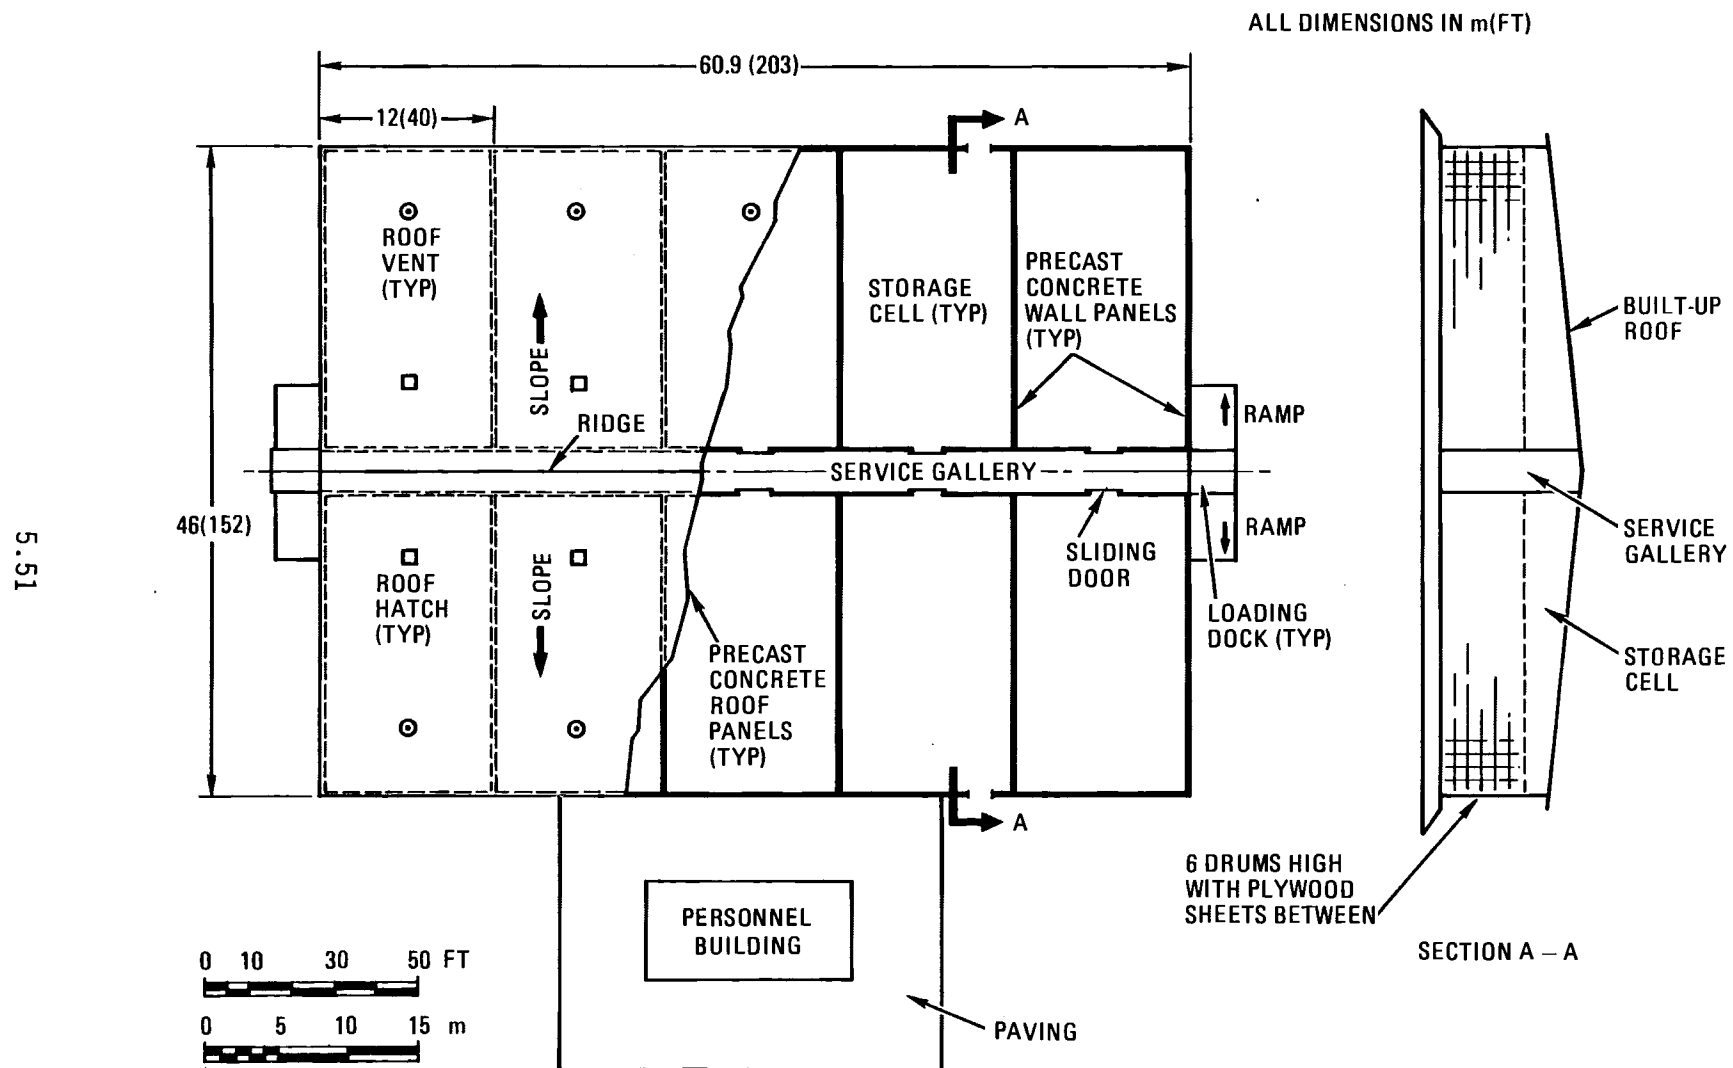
Indoor Storage Facility for CHTRU Waste
